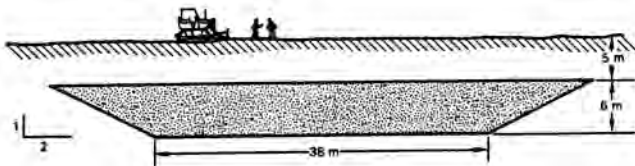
Grout Monolith and Soil Barrier System for Disposal of Hanford Facilities Waste
